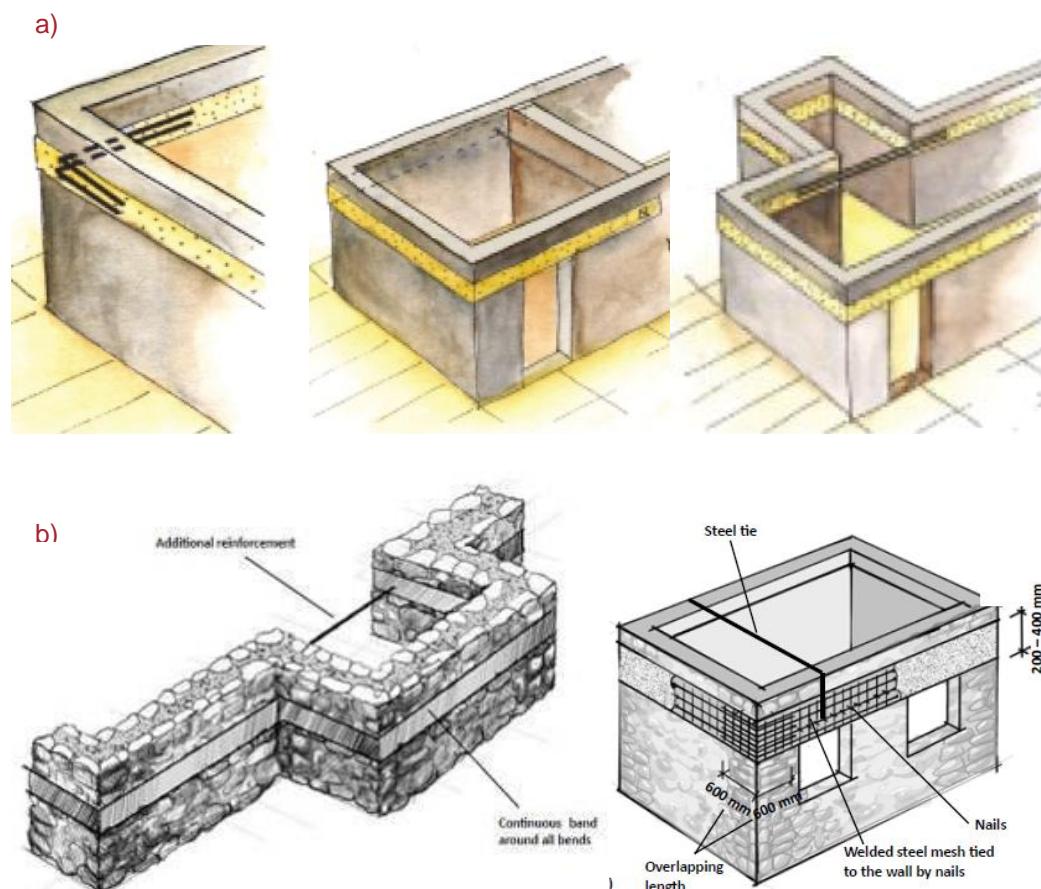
a) Seismic belts around various locations (source: UNDP, UNECO & GOI, 2007) b) Additional reinforcement (source: R. Desai and GOM 1998)
